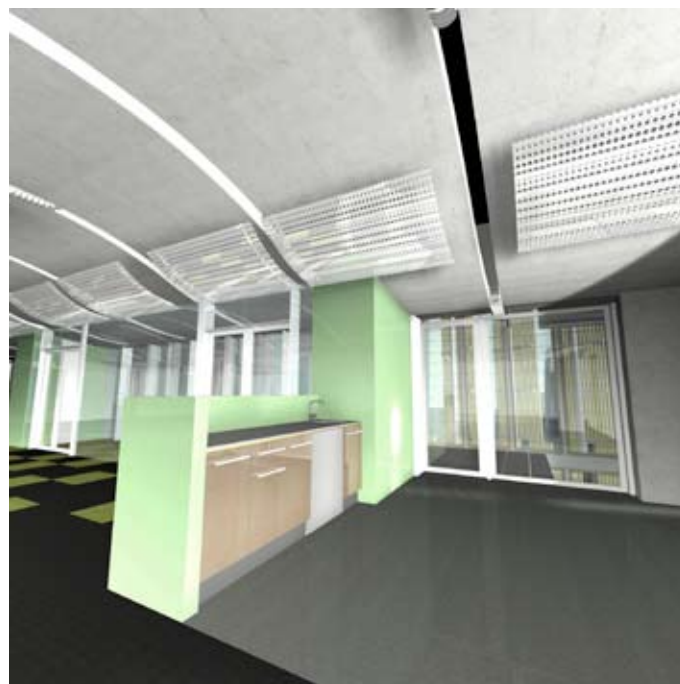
High thermal mass precast concrete ceiling panels (DesignInc Melb)
